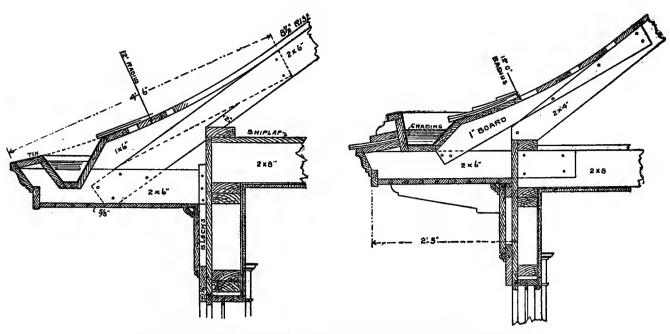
B—CONSTRUCTION FOR CURVING EAVES
